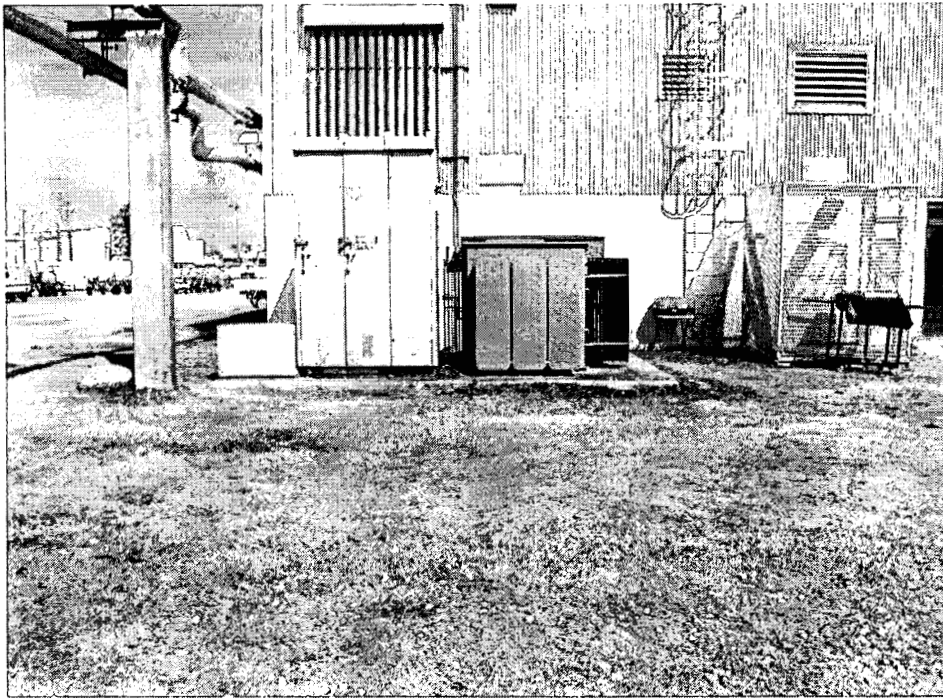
Southwest side of Building AS-4106 (viewed facing northeast).
